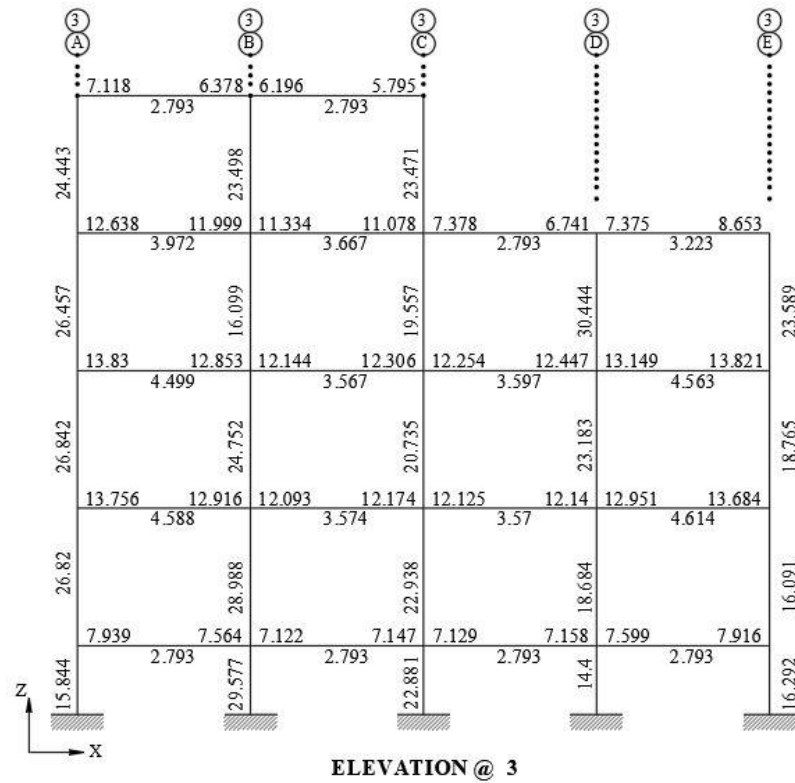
Reinforcement details for 4 storey building for grid -3
